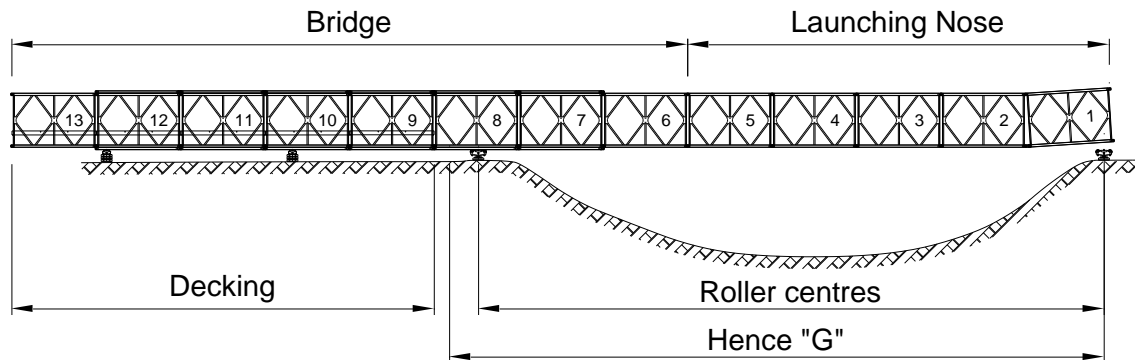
LAUNCHING ARRANGEMENT - 28 METRES BRIDGE
